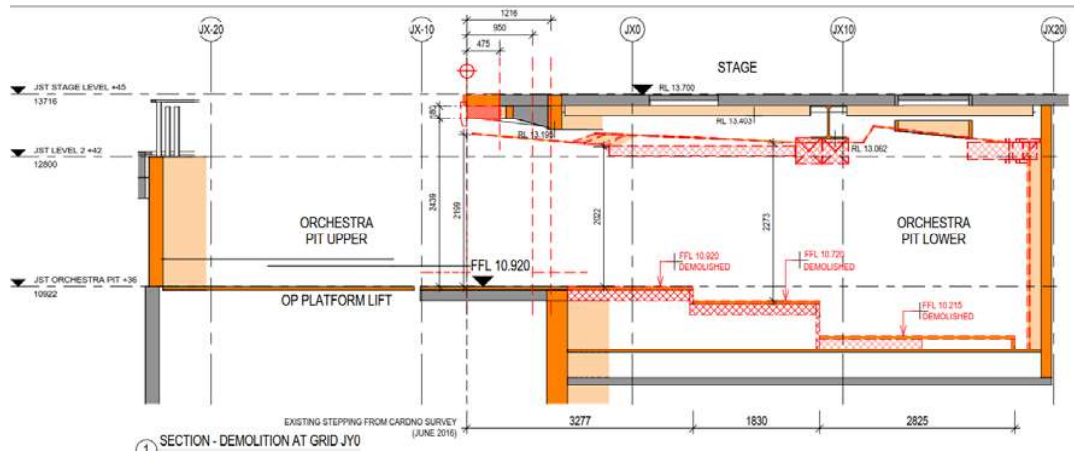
Section view of Orchestra Pit Ceiling and Platform demolition
